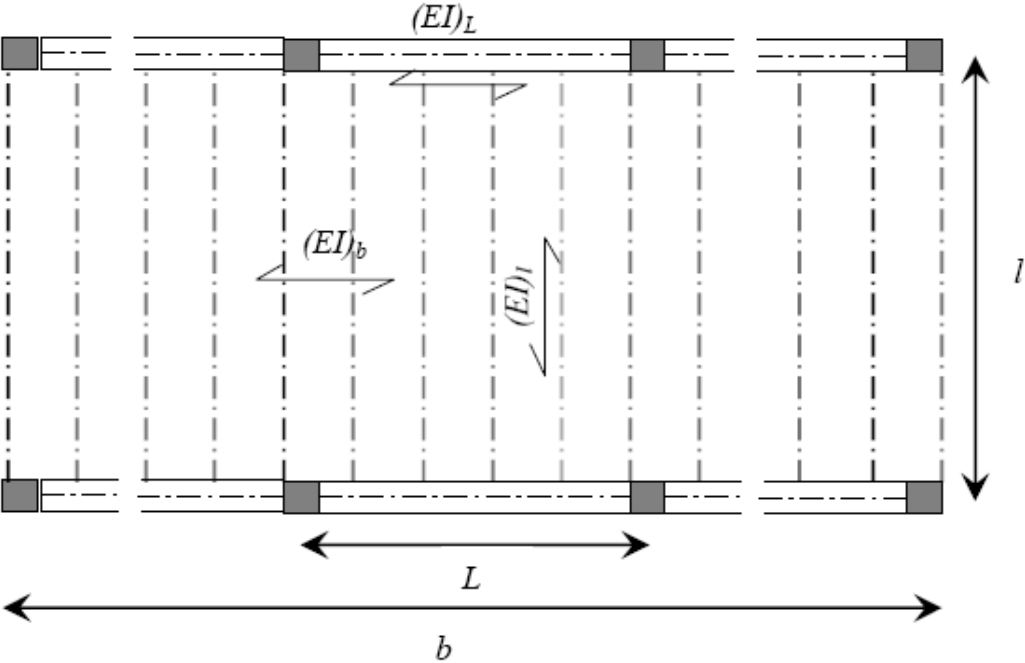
Typical floor sub-division, which includes the surface plate, floor beams and main girders
